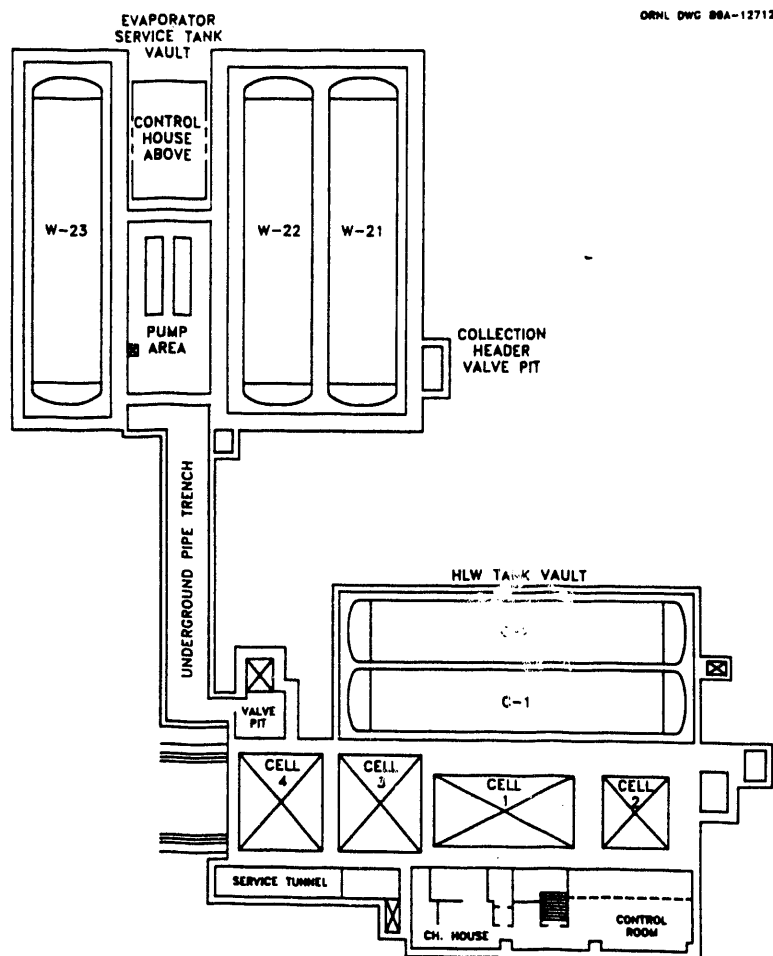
Plan view of the Evaporator Facility Complex (Building 2531).
